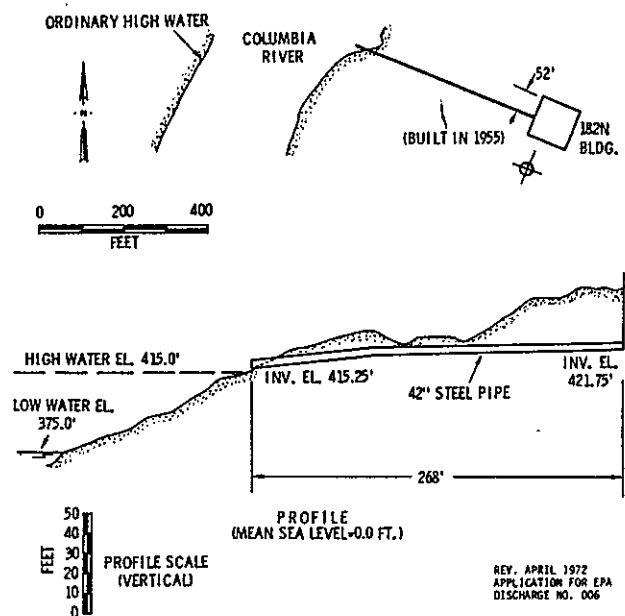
D-7 OVERFLOW AND FLOOR DRAIN DISCHARGE, 100-N AREA
